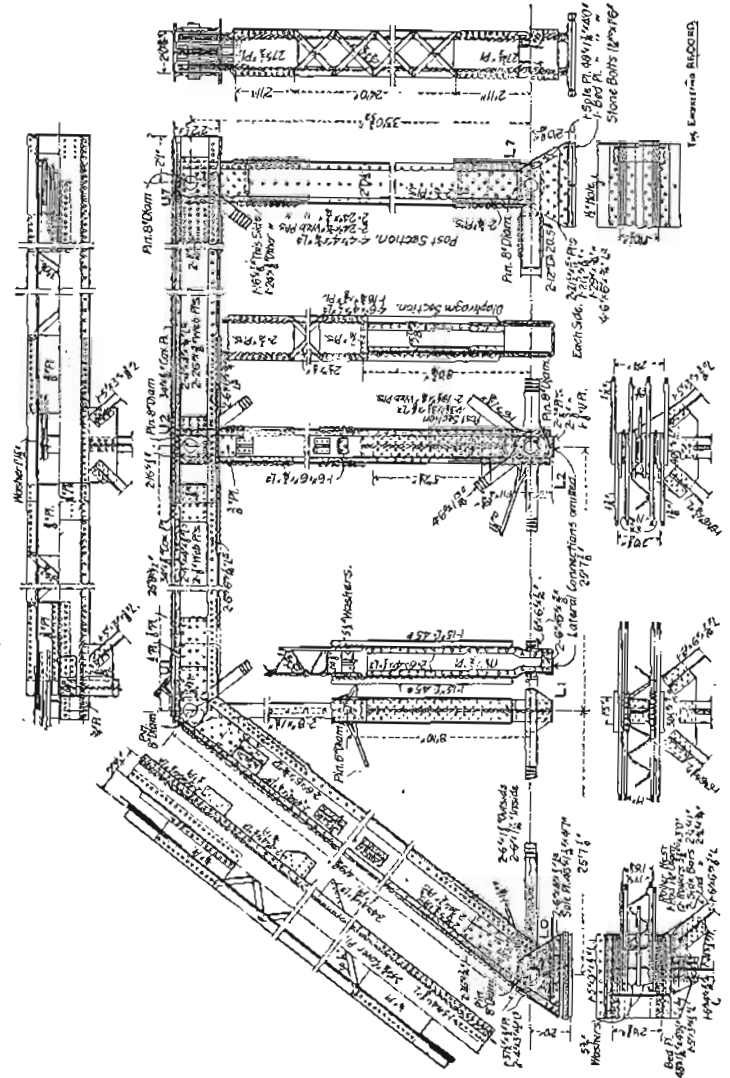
Union Railroad Double-track Through Bridge over the Pittsburg, Virginia and Charleston Railroad at Fort Perry, Va. Span, 177 1/2 feet. Built in 1897. See references to various details in Arts. 73, 74, 77, 79, 81, and 96.
